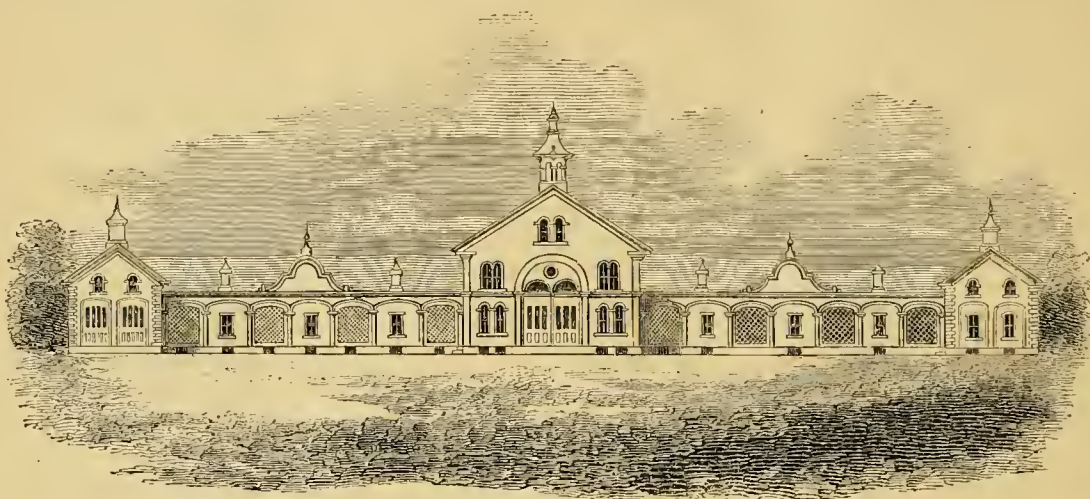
ELEVATION OF BARN, FACING NORTH.
